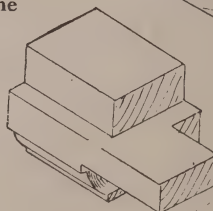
Enlarged Detail of Joint of Top Rail and Stile
